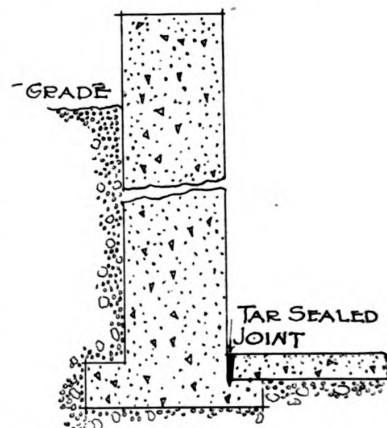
This sketch shows the method of caulking the joint between floor and wall when leaks are due to open joint there.
